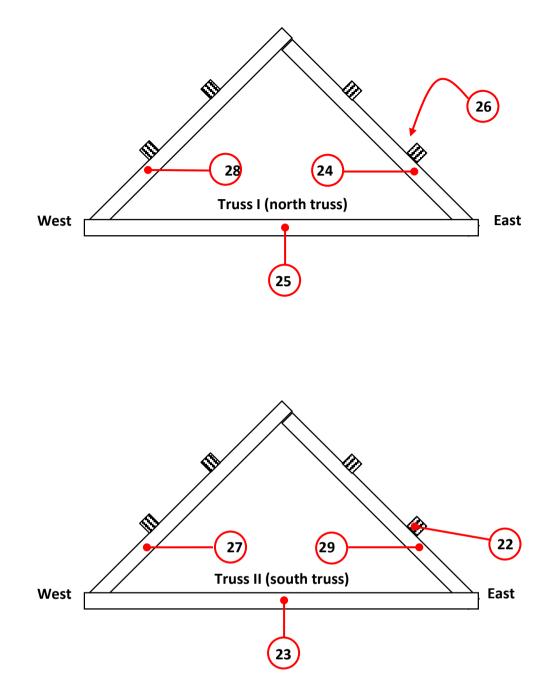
Sections through the roof trusses of building 3 to locate sampled timbers (see Table 1)
